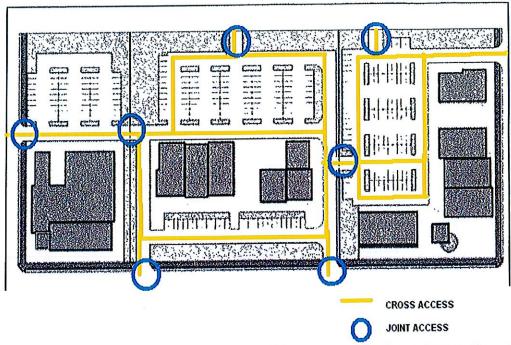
Cross access between parking areas and adjacent properties. Joint access through the use of common driveways entrances and between properties.
